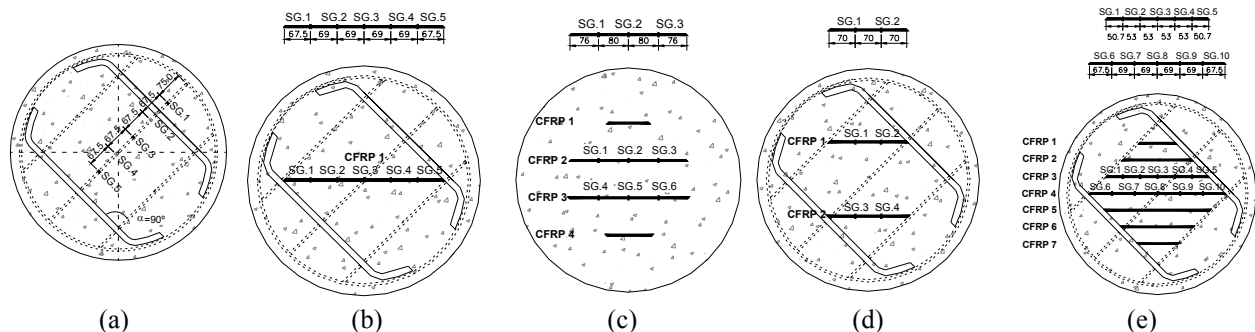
Strain gauges applied in the: (a) steel stirrups; (b, c, d, e) laminates (dimensions in mm)
